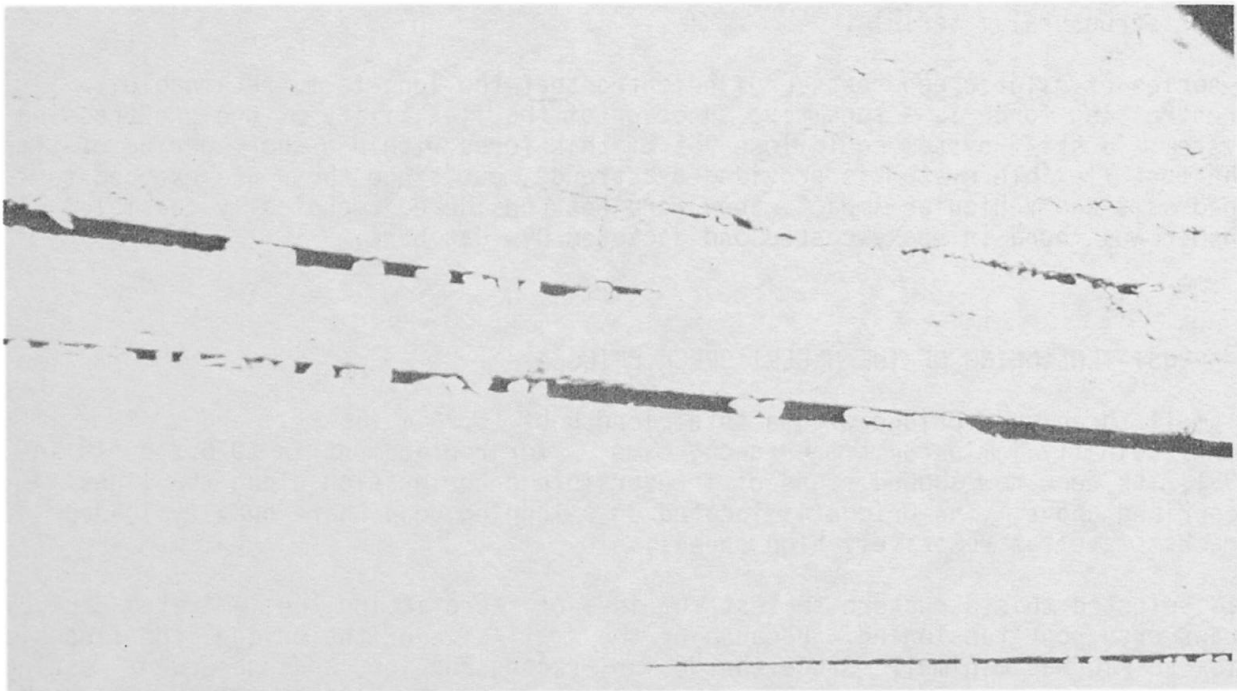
Separation of Laminated Timber Decking Due to Incompressible Materials
